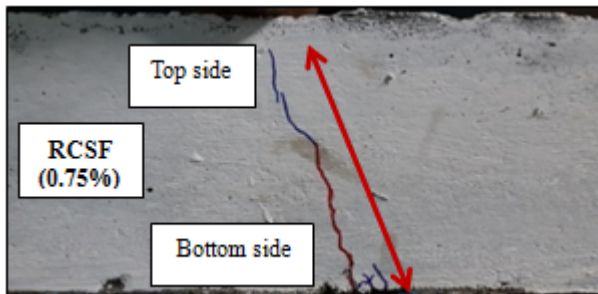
Cracking pattern for steel fibers reinforced concrete slab (0.75%)
